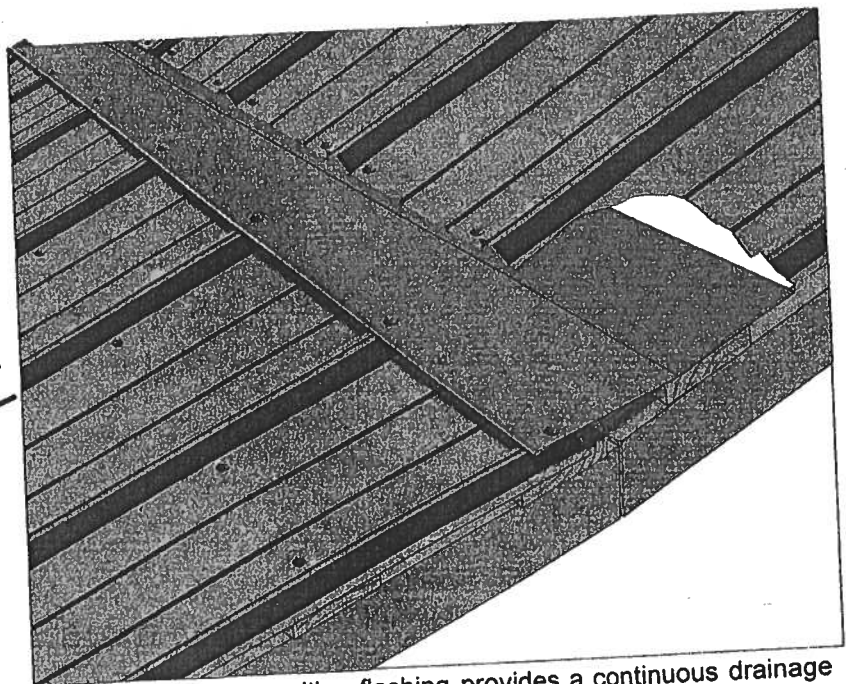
The transition flashing provides a continuous drainage where two slopes meet.
